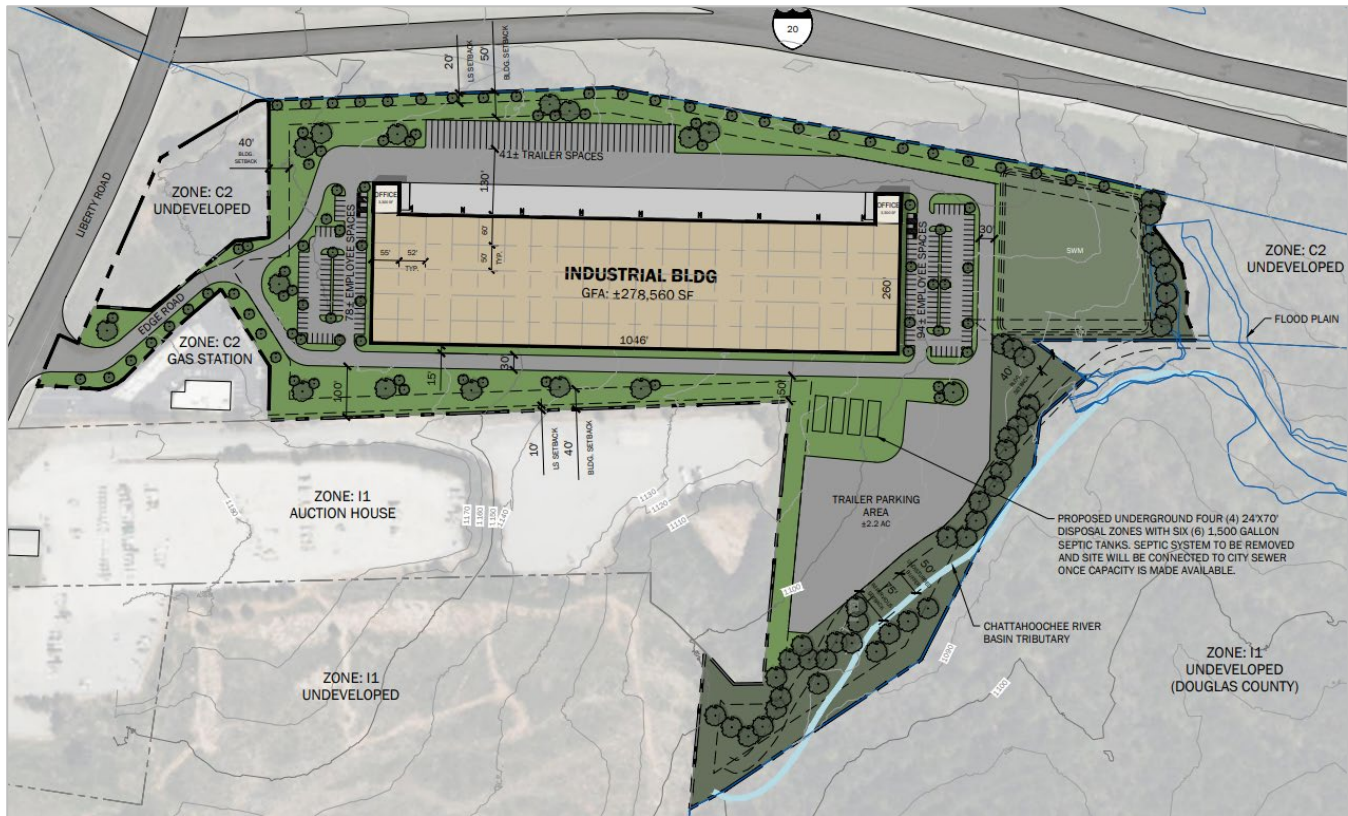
SITE PLAN. 700 EDGE ROAD.
